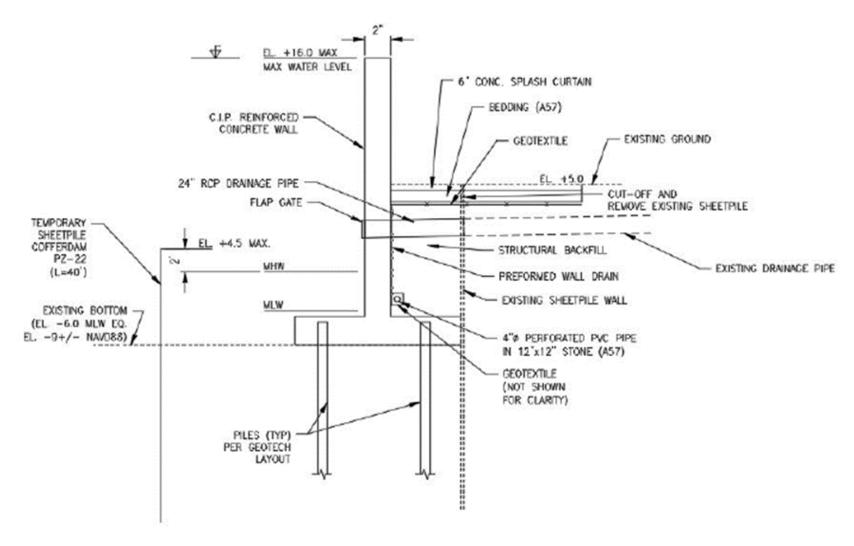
Typical Section Type B Concrete Cantilever Floodwall on Piles (Perimeter Plans)
